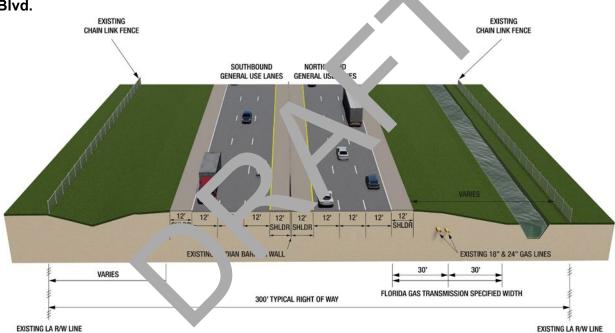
Existing Typical Section from South of Atlantic Blvd. to Wiles Rd.
